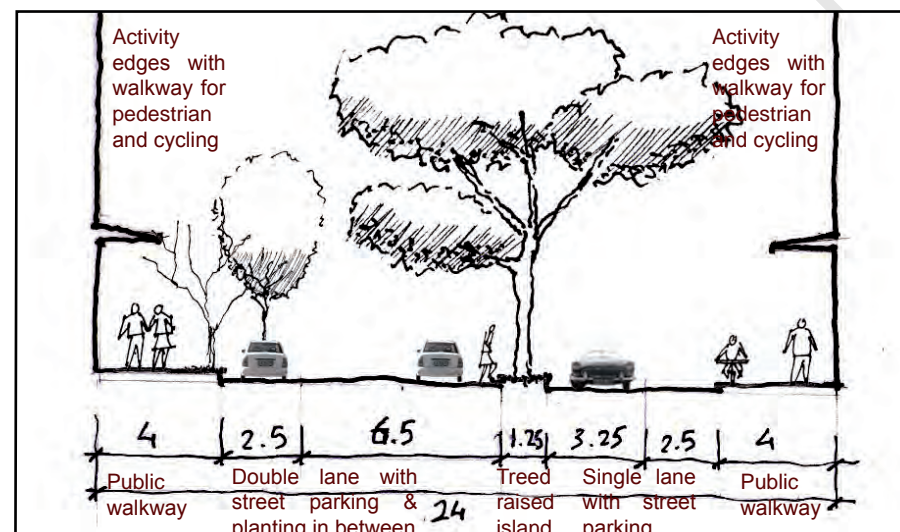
Generic section through a busy street (Source: Author's sketch)
